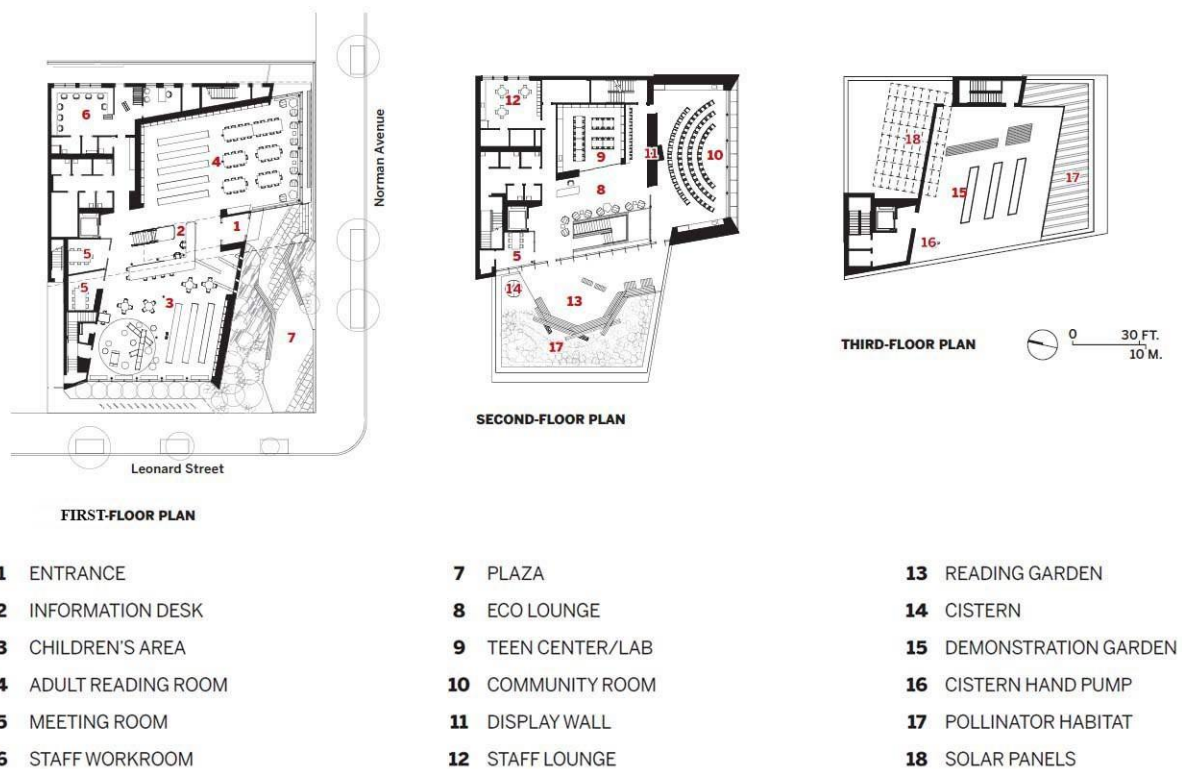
Floor Plans of Green-Point Library and Environment Education Centre
